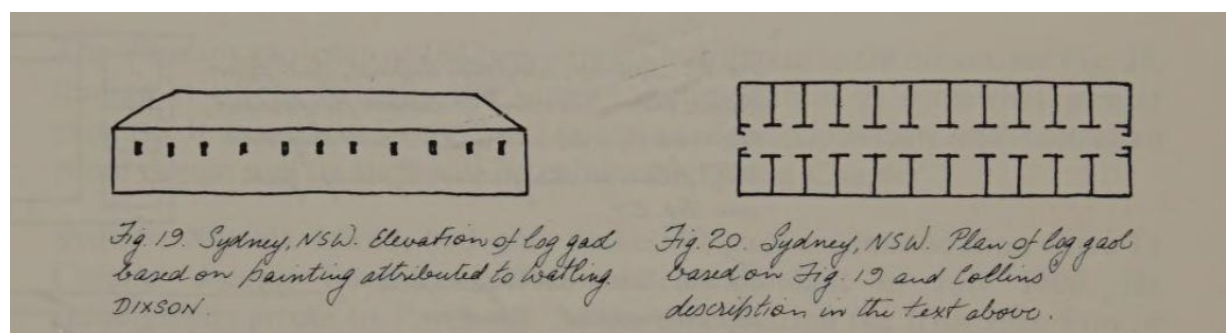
Conjectural reconstruction of elevation and plan of Sydney gaol by Kerr (Design for Convicts, p19).
